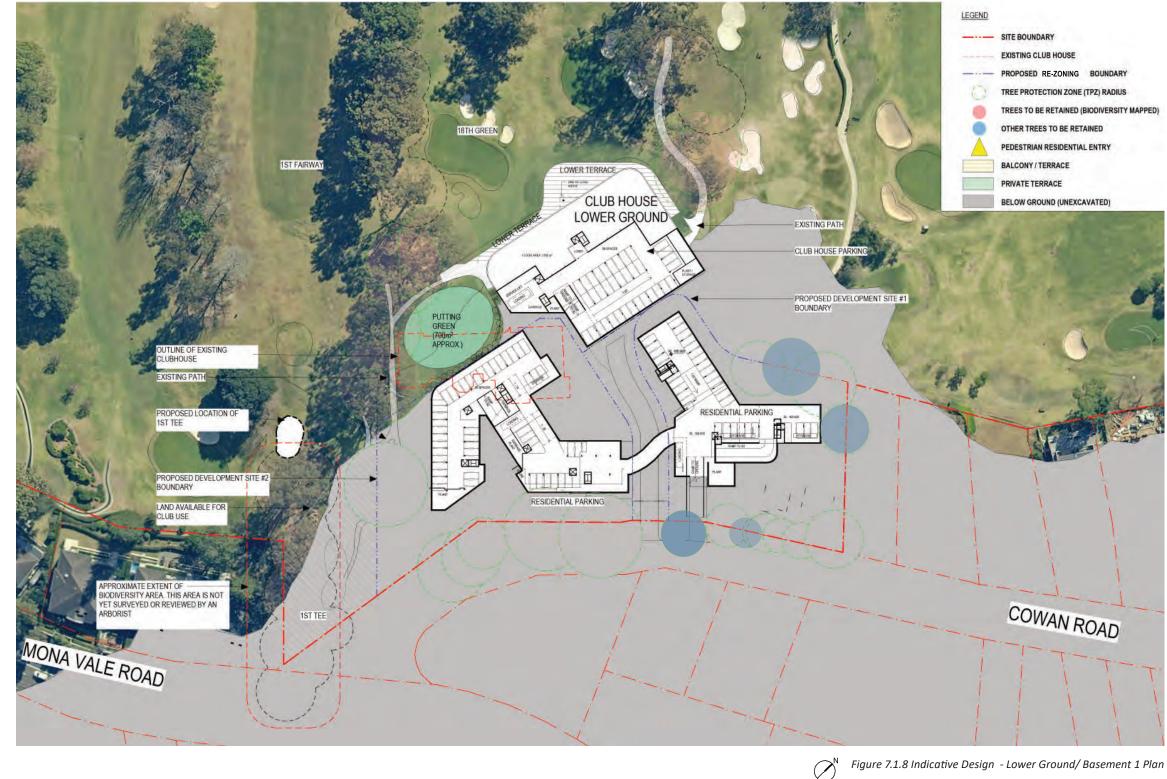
Indicative Design - Lower Ground/ Basement 1 Plan
